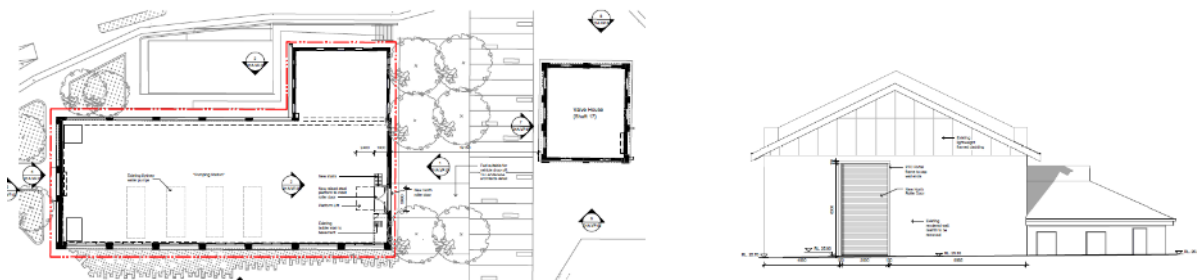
Stage 2 works include installing a new roller door to the northern wall of the Pump House, to provide emergency access for Sydney Water vehicles if McEvoy Street access is prevented by road widening
